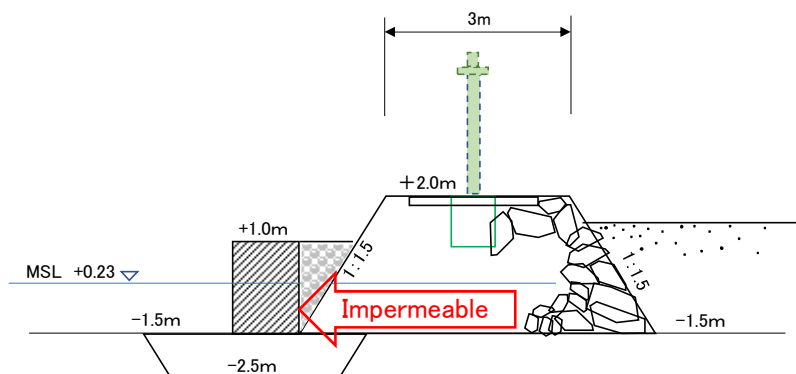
(9) Simplified cross section of temporary quay attached to second groyne (impermeable structure)
